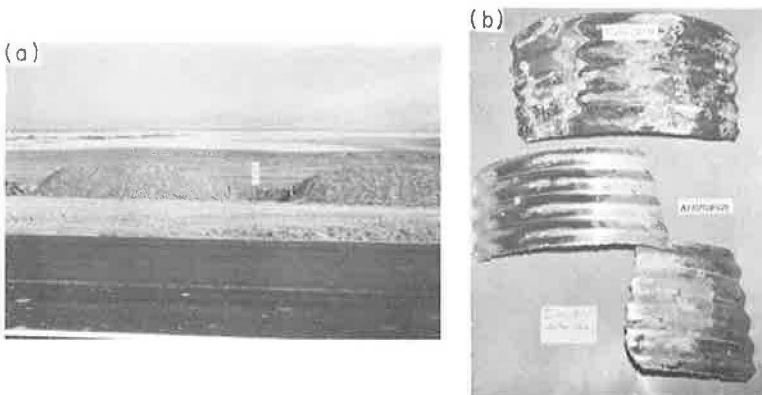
Field test site, XI-Imp-187-F, left of Sta. 498±: (a) field test site: (b) backfill side of culvert samples—approximately 1.7 yr of exposure. (Dark areas on steel and light areas on aluminum are locations of corrosion.)
